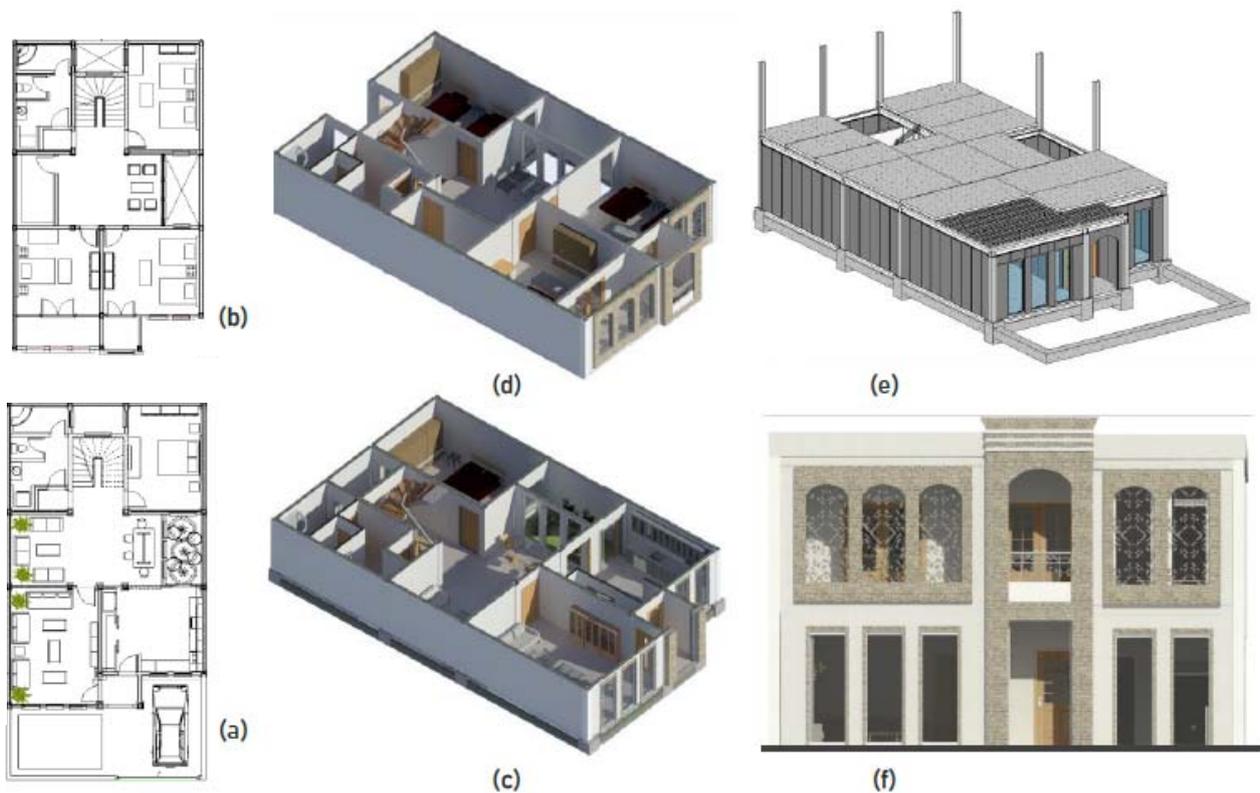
Prefabrication prototype; (a) Ground floor plan, (b) First floor plan, (c) Ground floor model, (d) First floor Model, (e) Unit structure (prefabrication elements), (f) House unit model.
